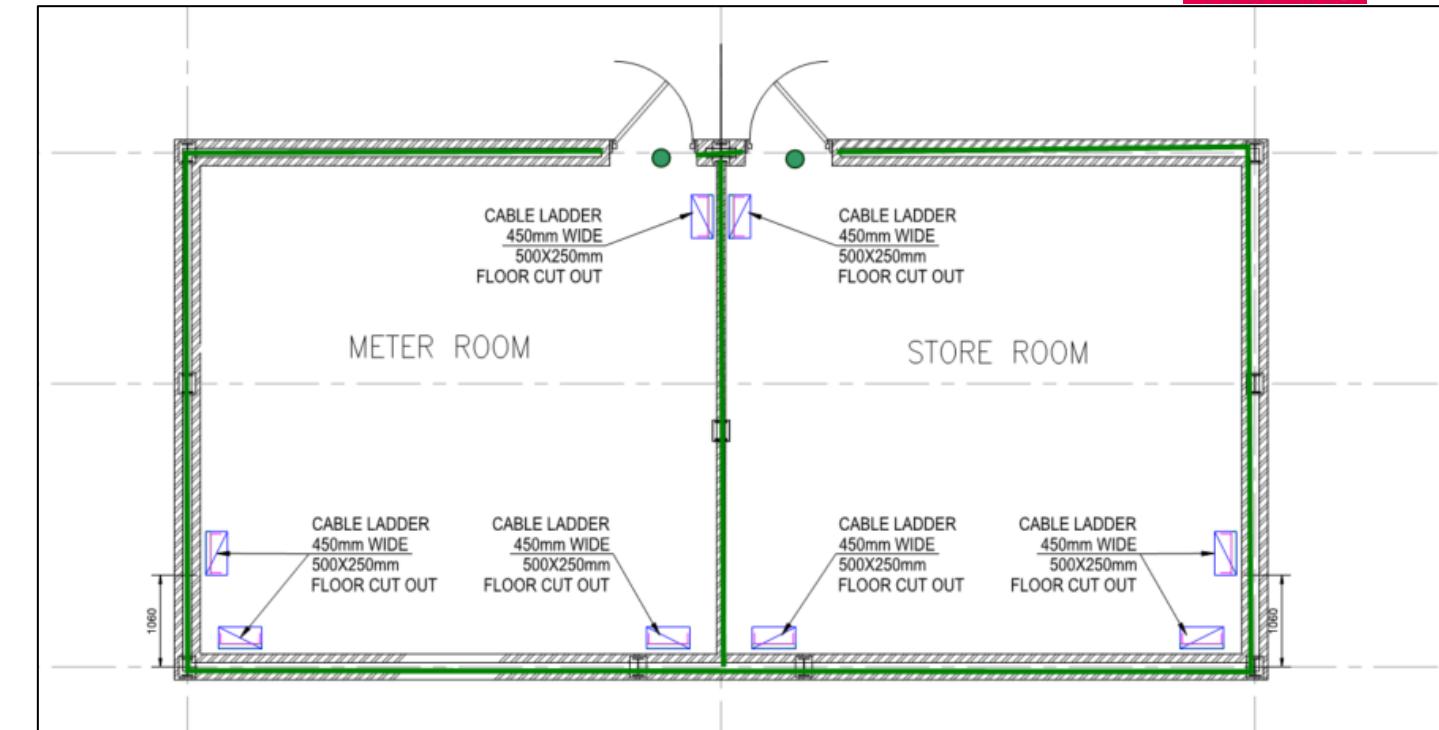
Plan Drawing of fire resistance HV Substation Ground Floor
